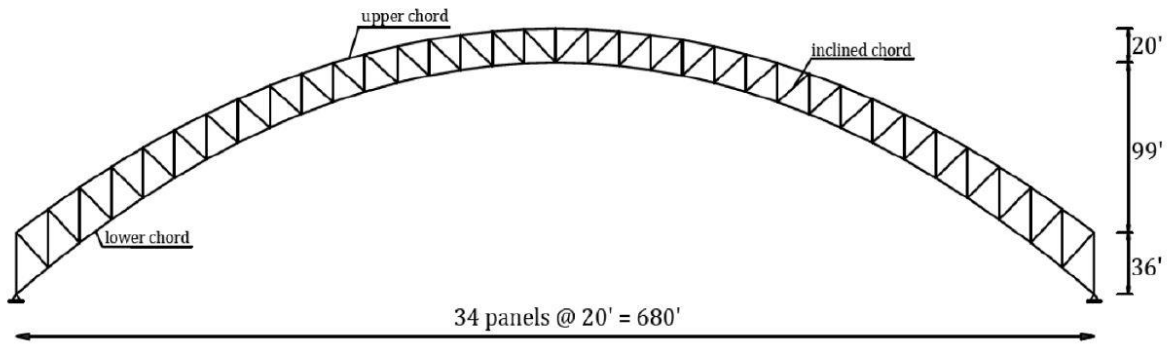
15 Elevation of Burro Creek Bridge (Makiabadi et al. 2013)
